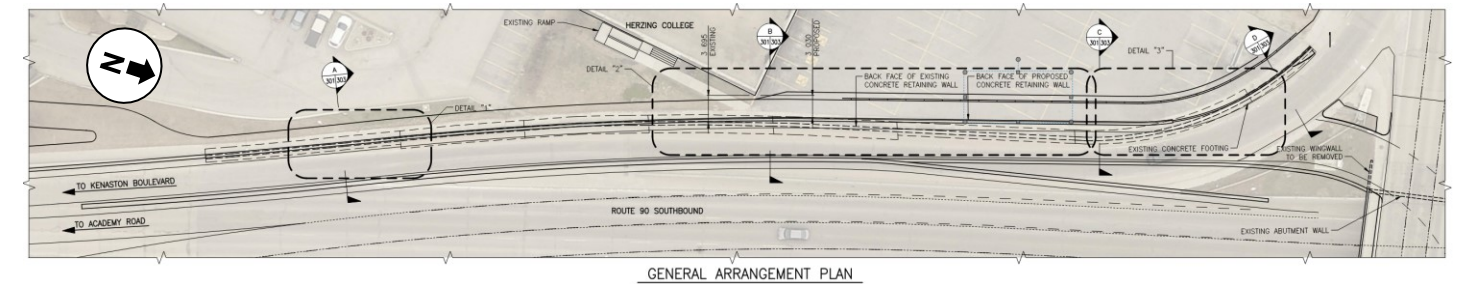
Retaining Wall at Portage Avenue Underpass
